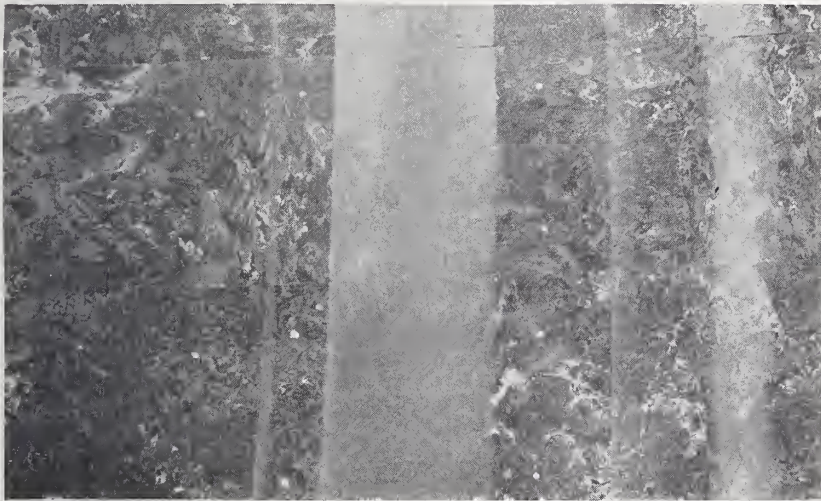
$\frac{1}{8}$ -in. linoleum tile on concrete subfloor (test panel 3R).
